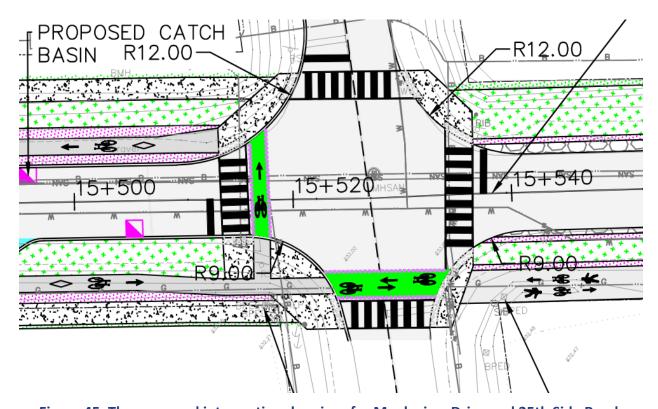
The proposed intersection drawings for Mapleview Drive and 25th Side Road.
